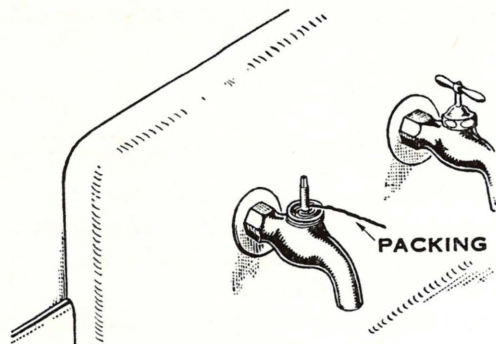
Packing should be wrapped around the valve stem, in the same direction the packing nut is turned down
